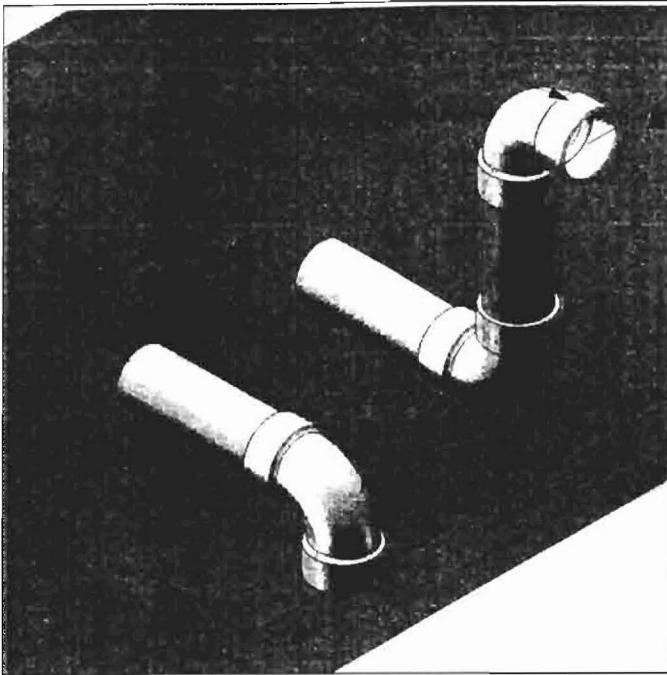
Direct Vent - Sidewall Termination of Vent and Combustion Air Piping
